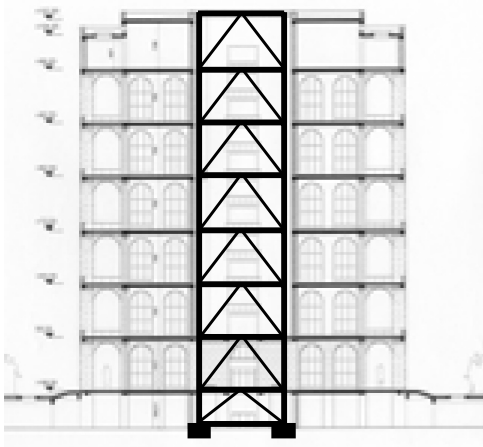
Transversal section of the building, with the additional steel structure placed inside the light well.
